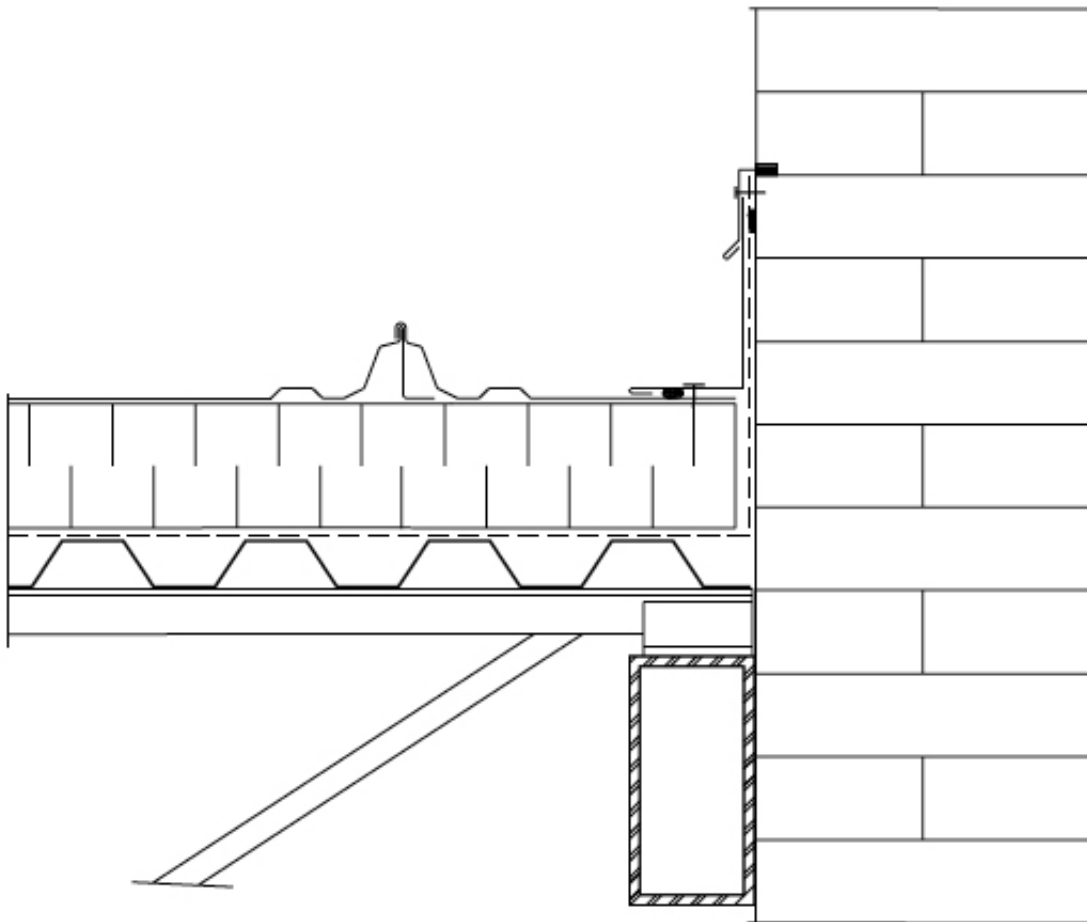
B: Roof to Wall Parallel to Sheet - Masonry WallInstallation/Assembly Notes:
